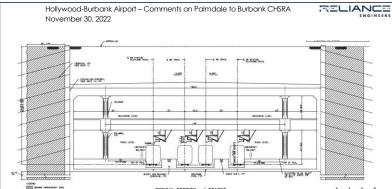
Section taken from CHSRA Palmdale to Burbank Project Section Tunnel Plans of April 2021,
